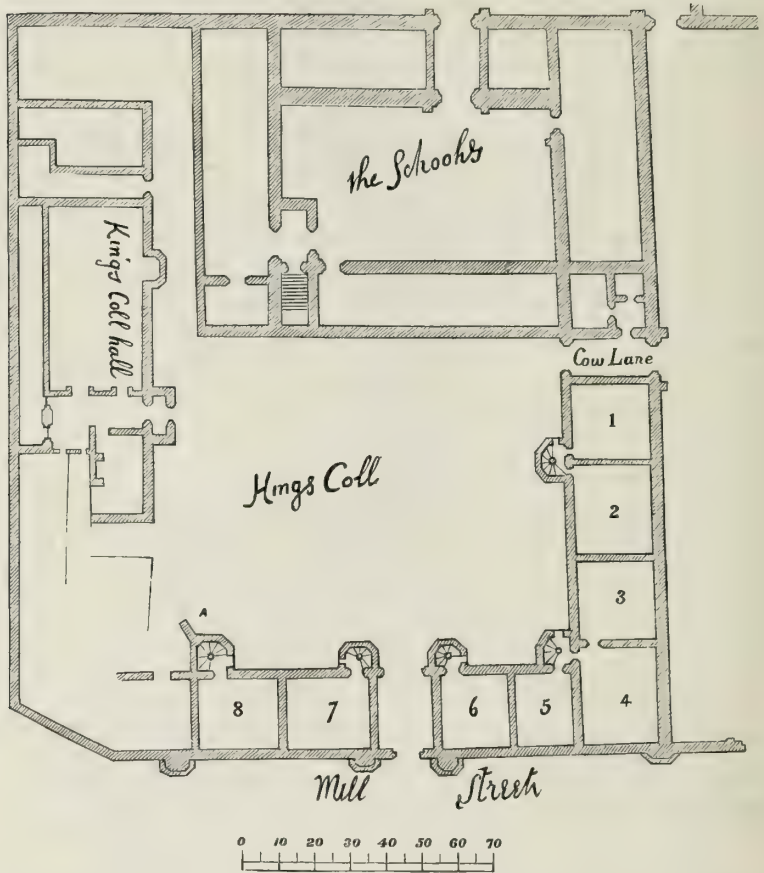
Ground Plan of the Old Court of King's College, reduced from a plan of Clare Hall made about 1635¹.
